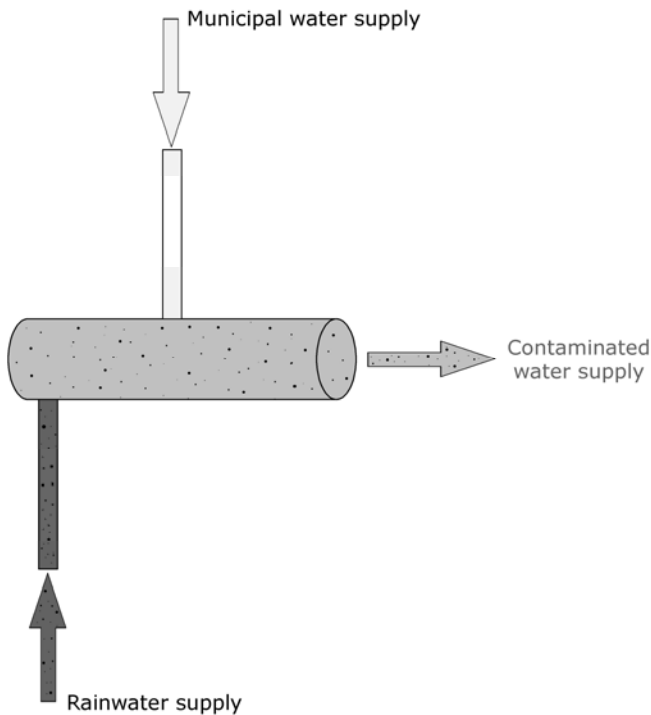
An example of how a rainwater pipe cross connection with municipal pipe can contaminate municipal water.
